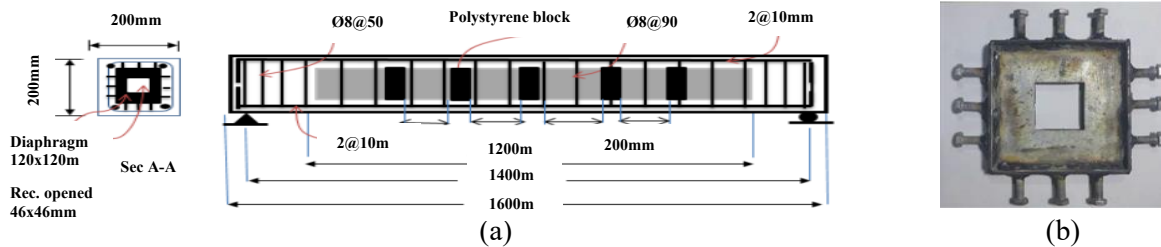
(a) Reinforcement and details of tested beam, (b) Steel diaphragm with rectangular opening.[14]
